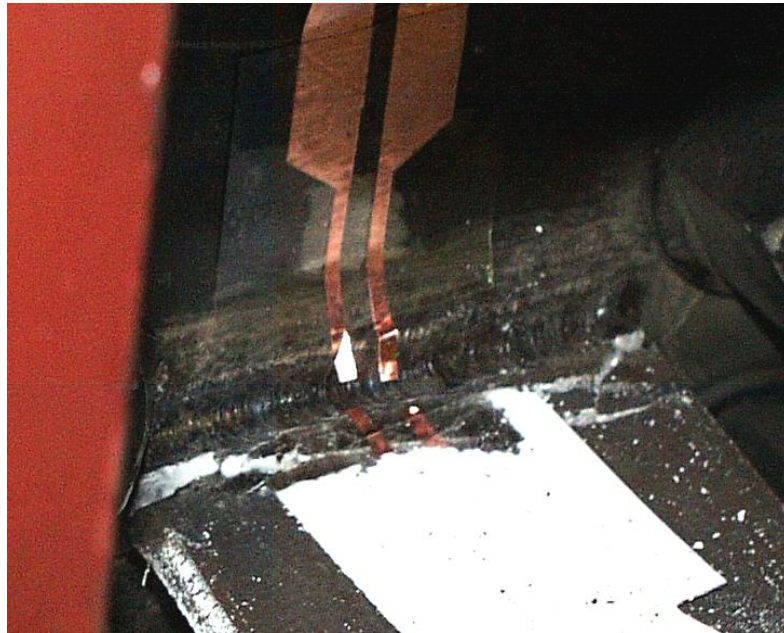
Point Switch After Beam Flange Failed Near Weld in Second Shear Link Specimen
